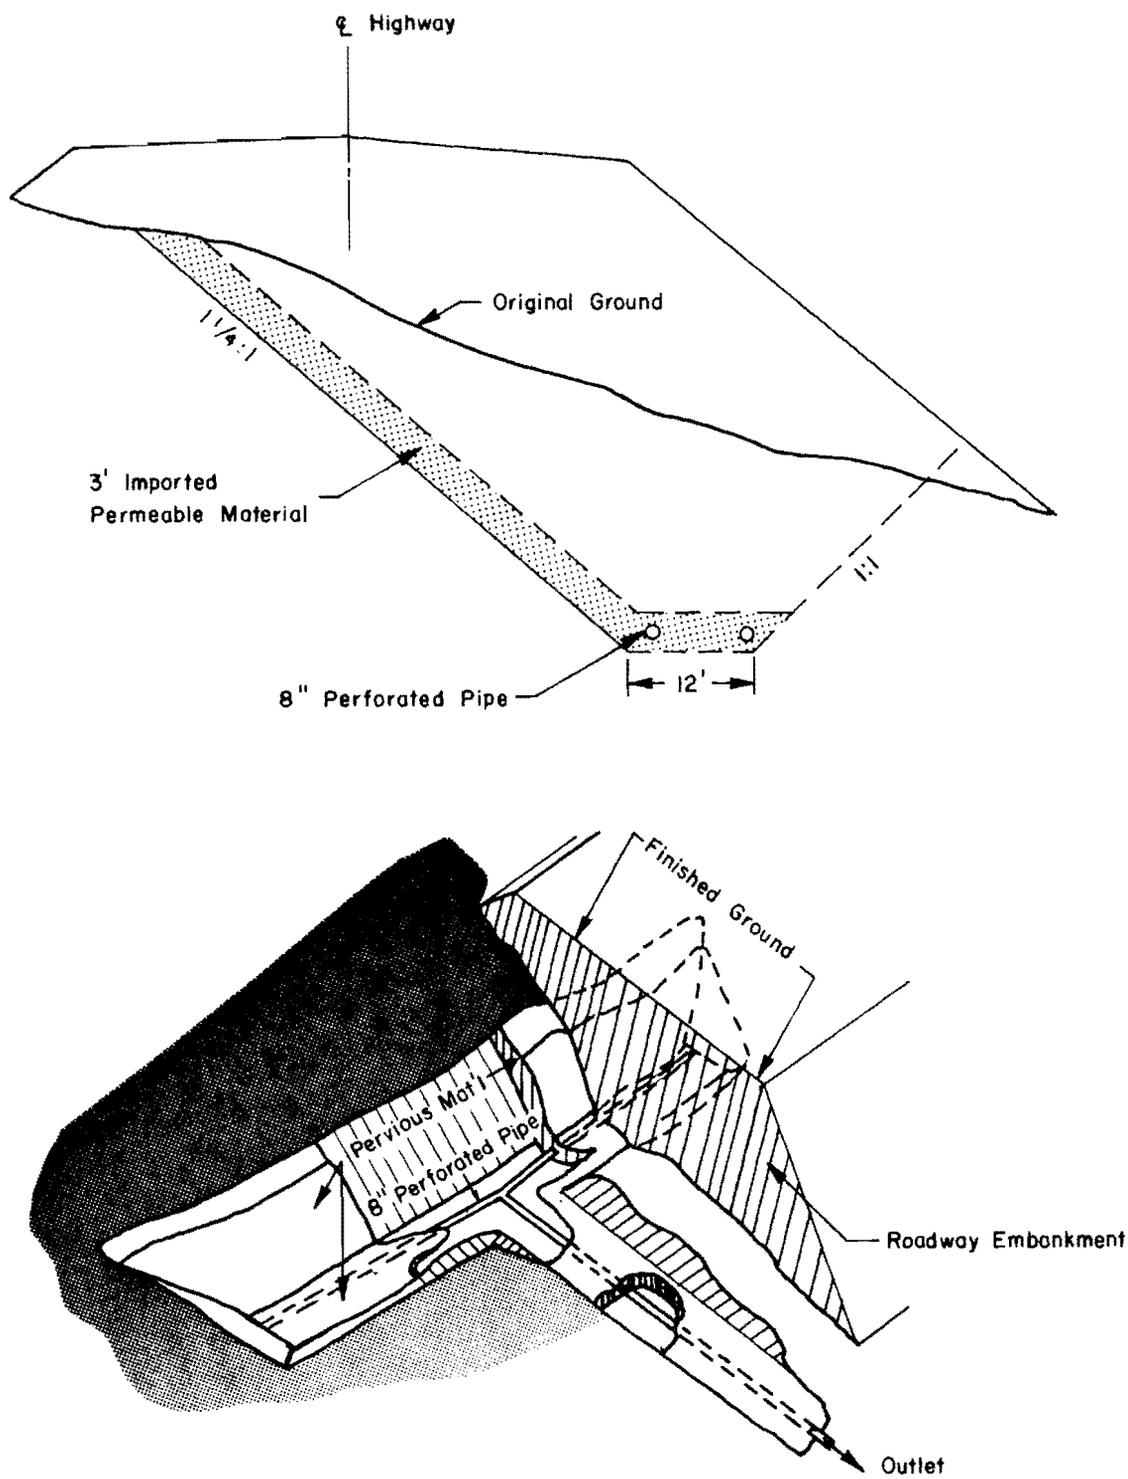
Longitudinal stabilization trench (Smith, 1964).
